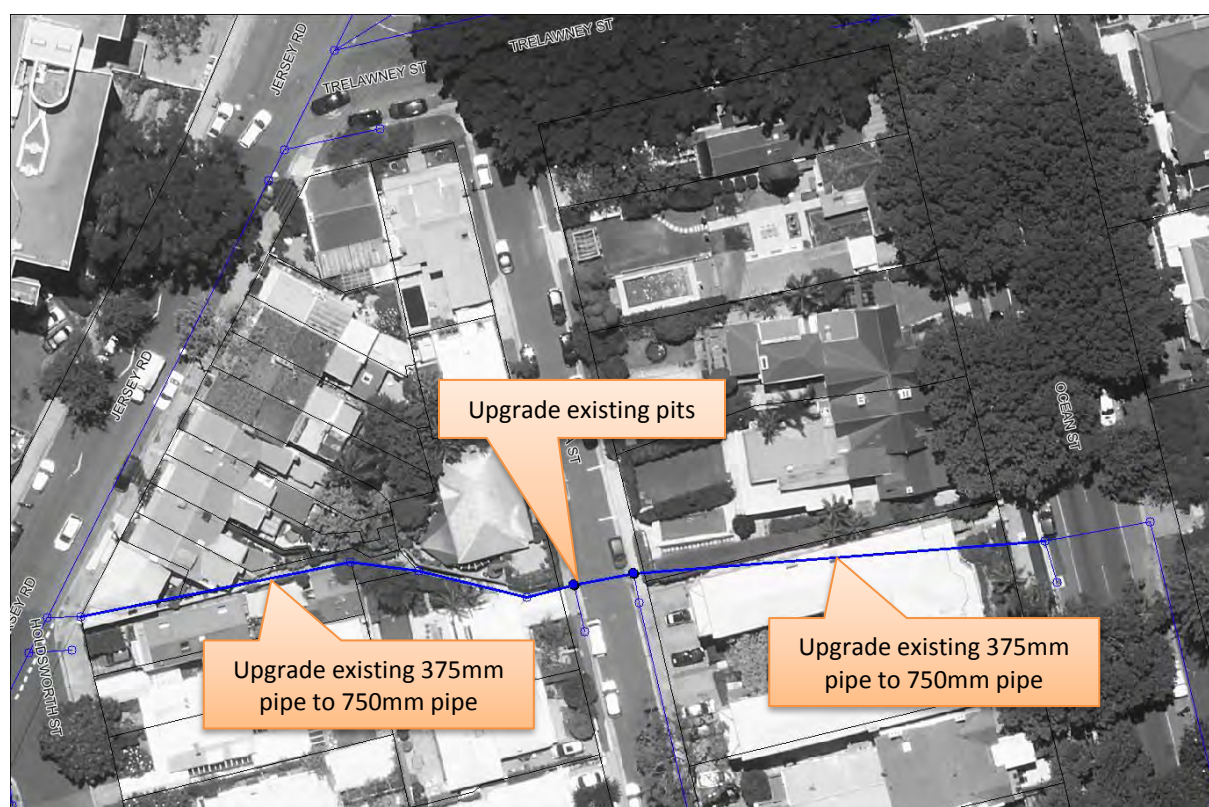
Design Concept for Ocean Street and Tara Street Drainage Upgrades
